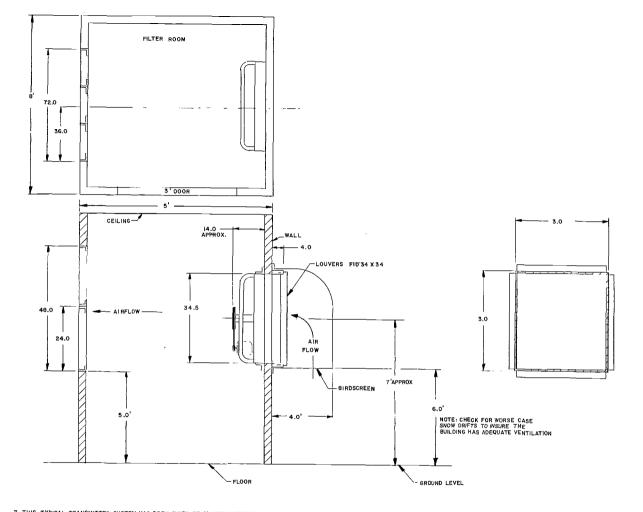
MW-50C3 OUTLINE DRAWING (SHEET 3 OF 4) 839 6587 128
